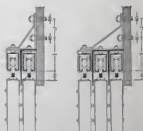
Cross-section showing side wall bracket attachment with weatherstrip of two parallel sliding doors, and of three parallel sliding doors.
